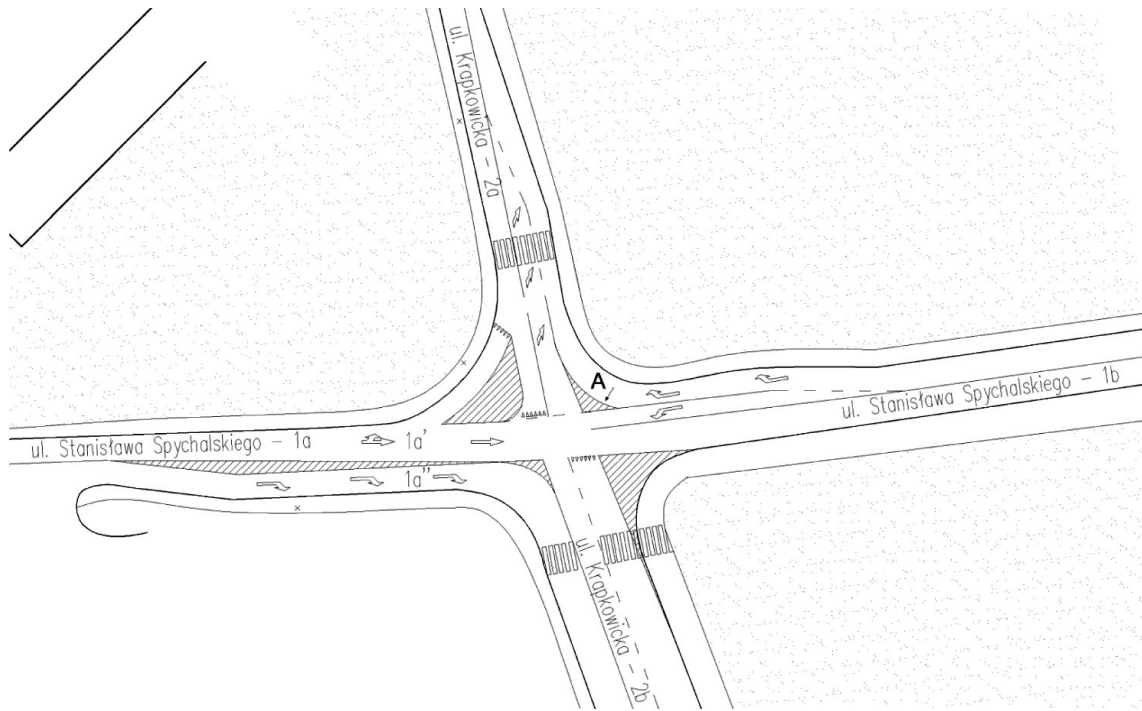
The crossroads of Stanisław Spychalski Street and Krapkowicka Street – a new concept
